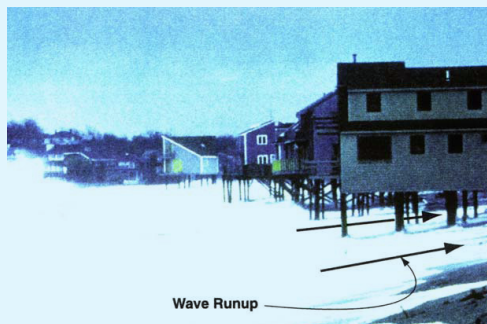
Erosion due to wave runup under elevated buildings in Scituate, Massachusetts (Photograph by Jim O'Connell).
